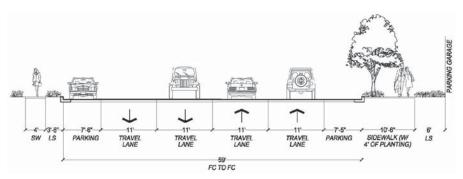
Existing cross-section of S. Eads Street between 20th Street S. and 23rd Street S.
